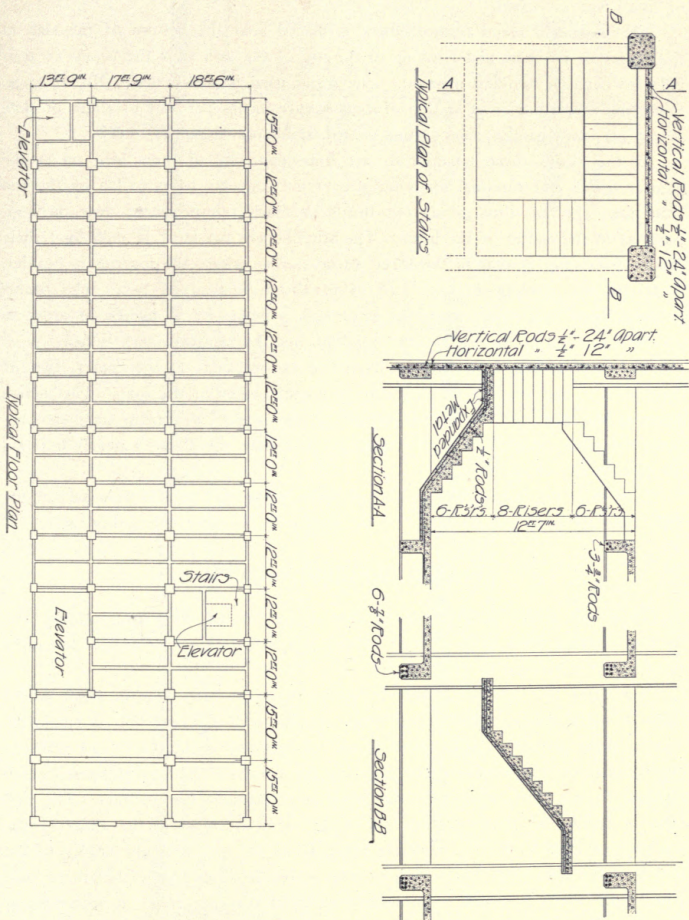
Typical Plan and Typical Stair Details of Lynn Storage Warehouse. (See p. 75.)
